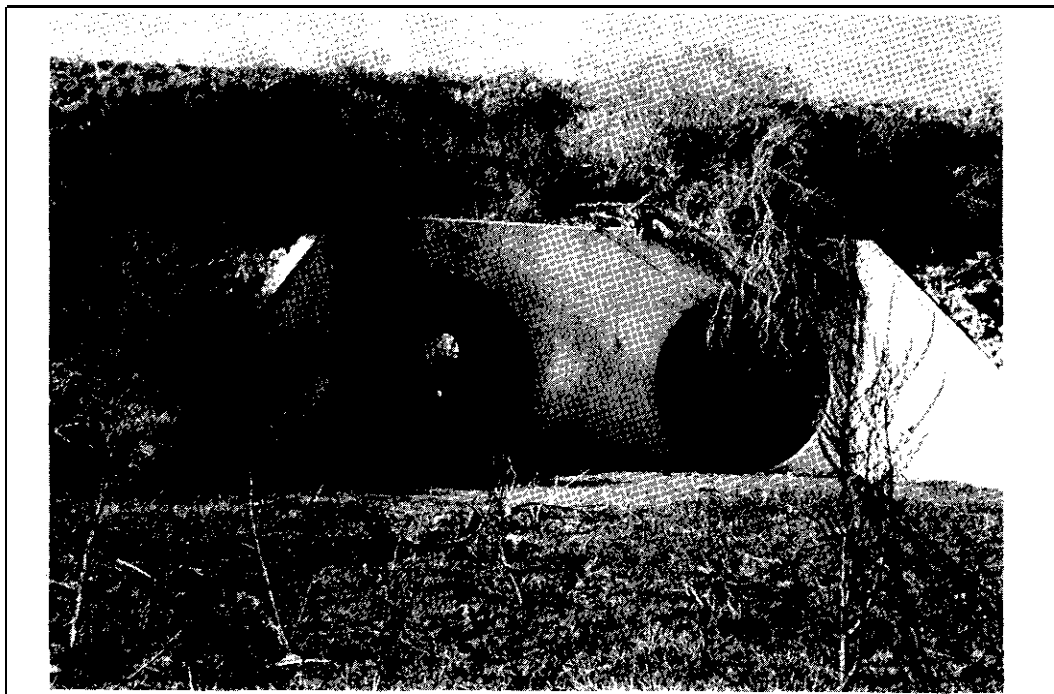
Flood Retention Structure and Inlet to Culvert Crossing Central Arizona Project, near Scottsdale, Arizona
